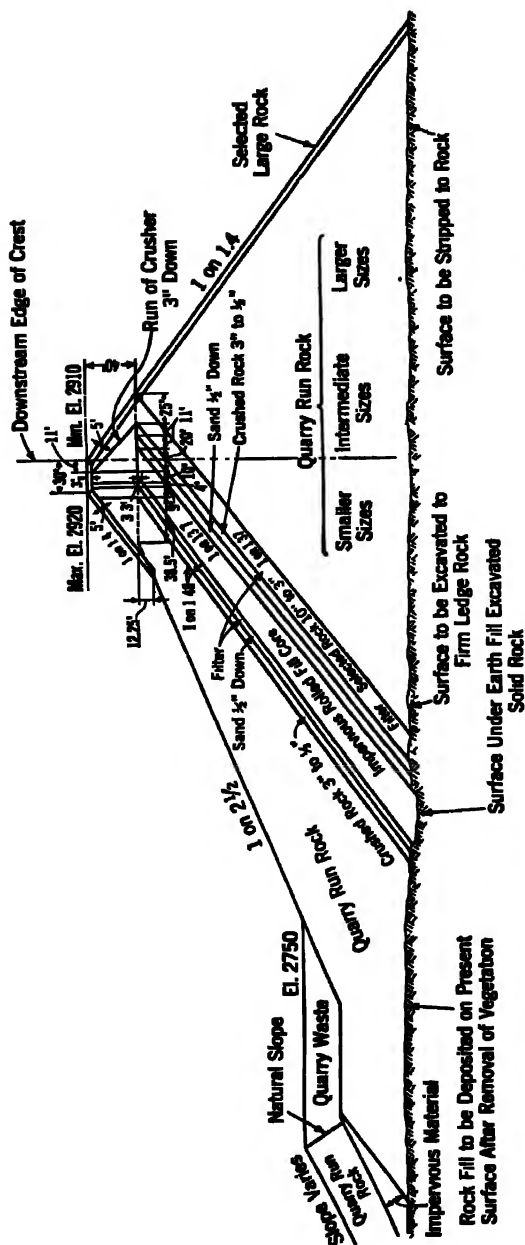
Nantahala Dam. (Nantahala Power and Light Co., North Carolina.)
